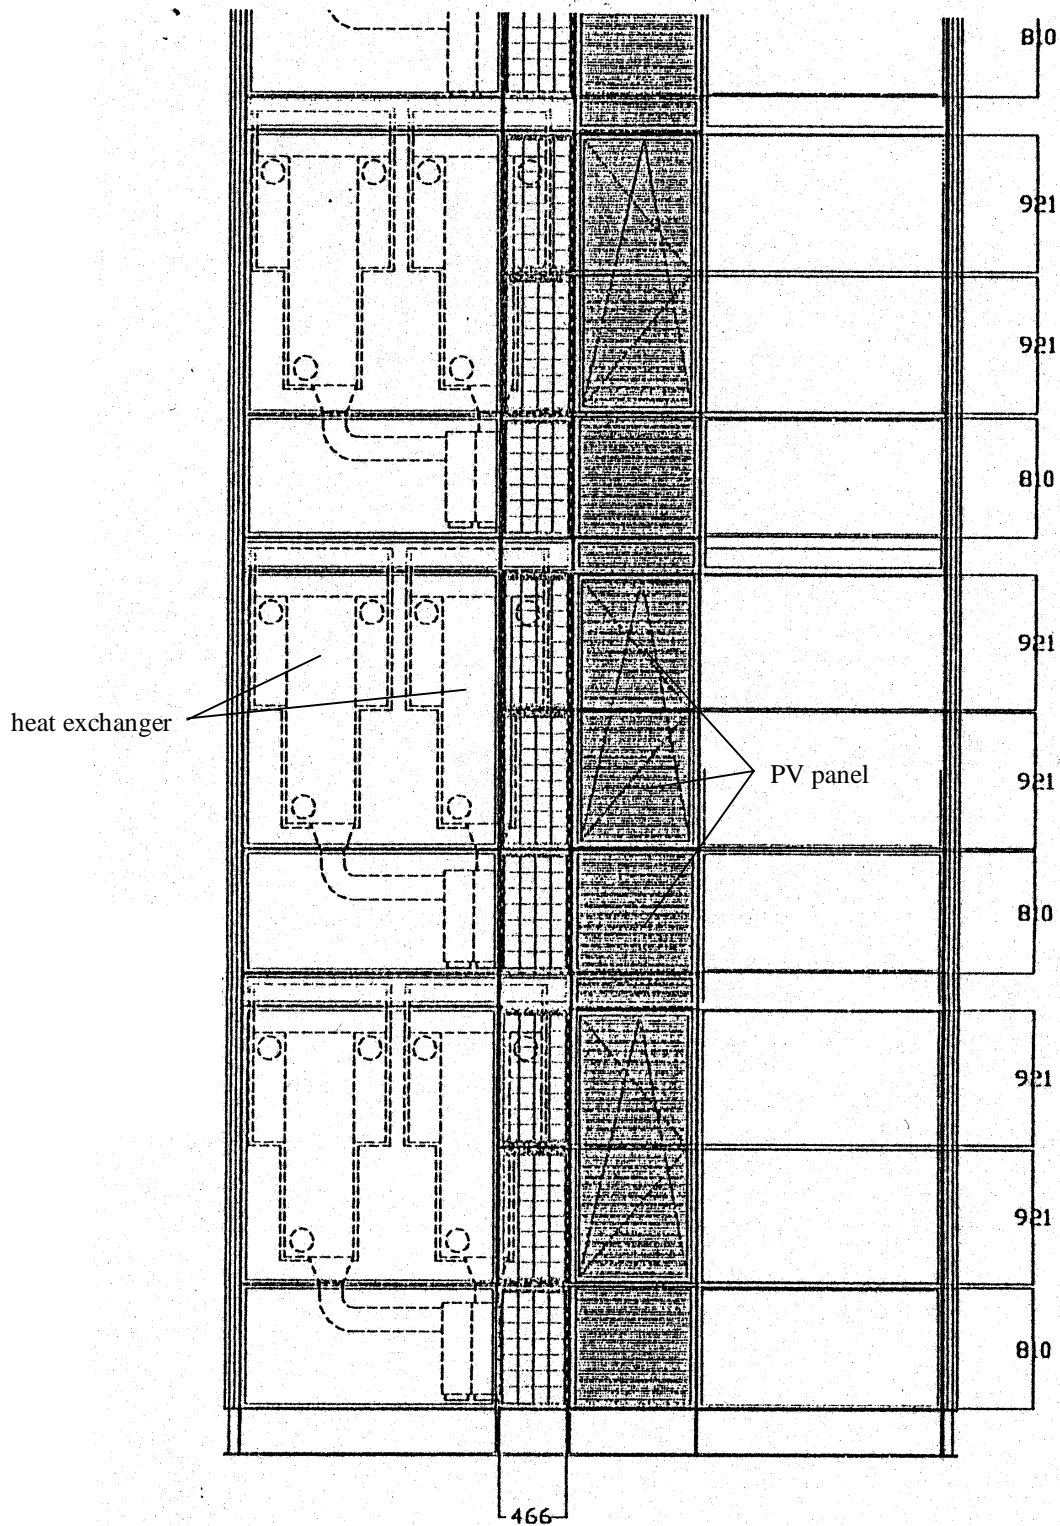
Location of the heat exchangers in the solar wall at Sundevedsgade 14.
